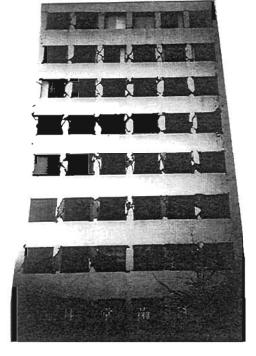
Distributed RC multion damage due to minimal damage in corner multions
